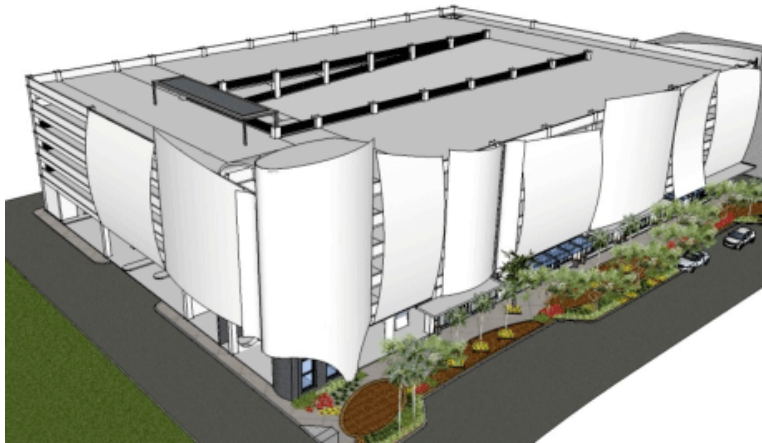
Palm Avenue Parking Garage, Downtown Sarasota Showing Accent and Detailing that Conceals Concrete Finish Providing A High-Tech Look.
